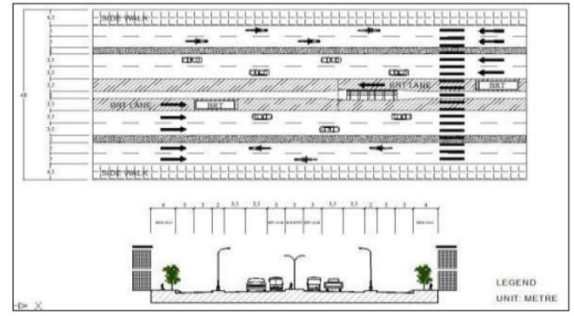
Cross section design on Ngo Quyen – Ngu Hanh Son street ($B > 38m$) [8]
